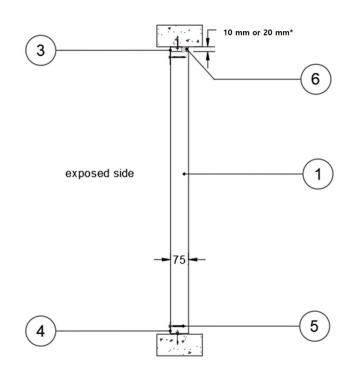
Cross section A-A. The image is included to demonstrate the location of the assessed joints. The separating element construction may vary based on the applicable Hebel panel construction details.
